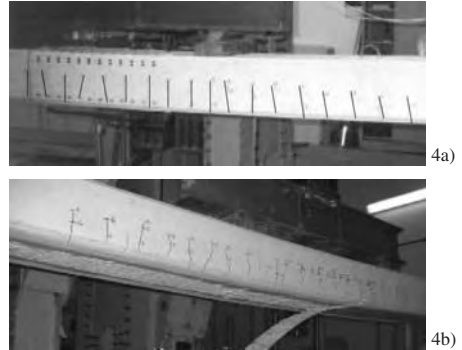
Cracking pattern: 4a) beam unstrengthened (D); 4b) beam strengthened (A1).
